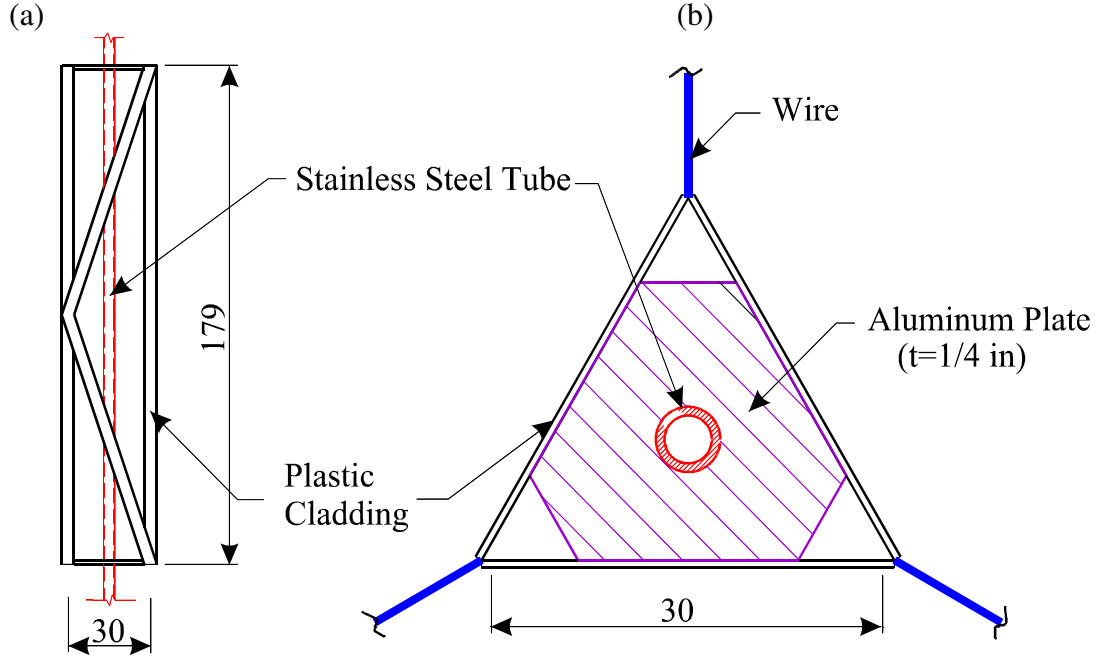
Guyed mast model (dimensions in mm): (a) elevation of typical mast section showing the spine and cladding; and (b) horizontal section.
